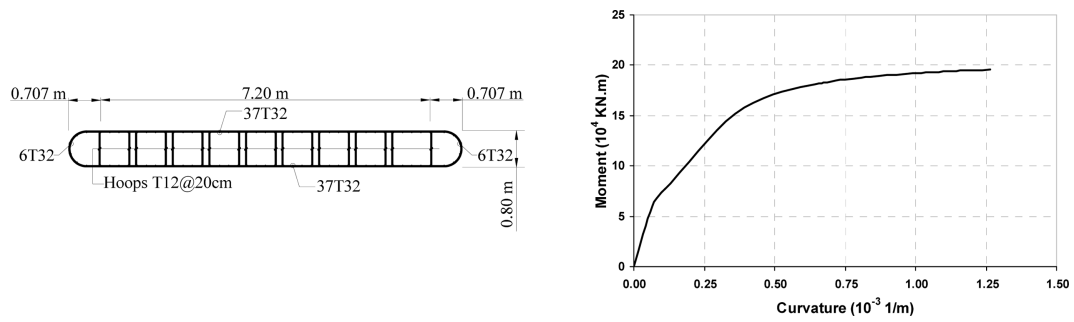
(c) Cross section and its moment curvature curve for the bridge pier (Sample bridge 3)
